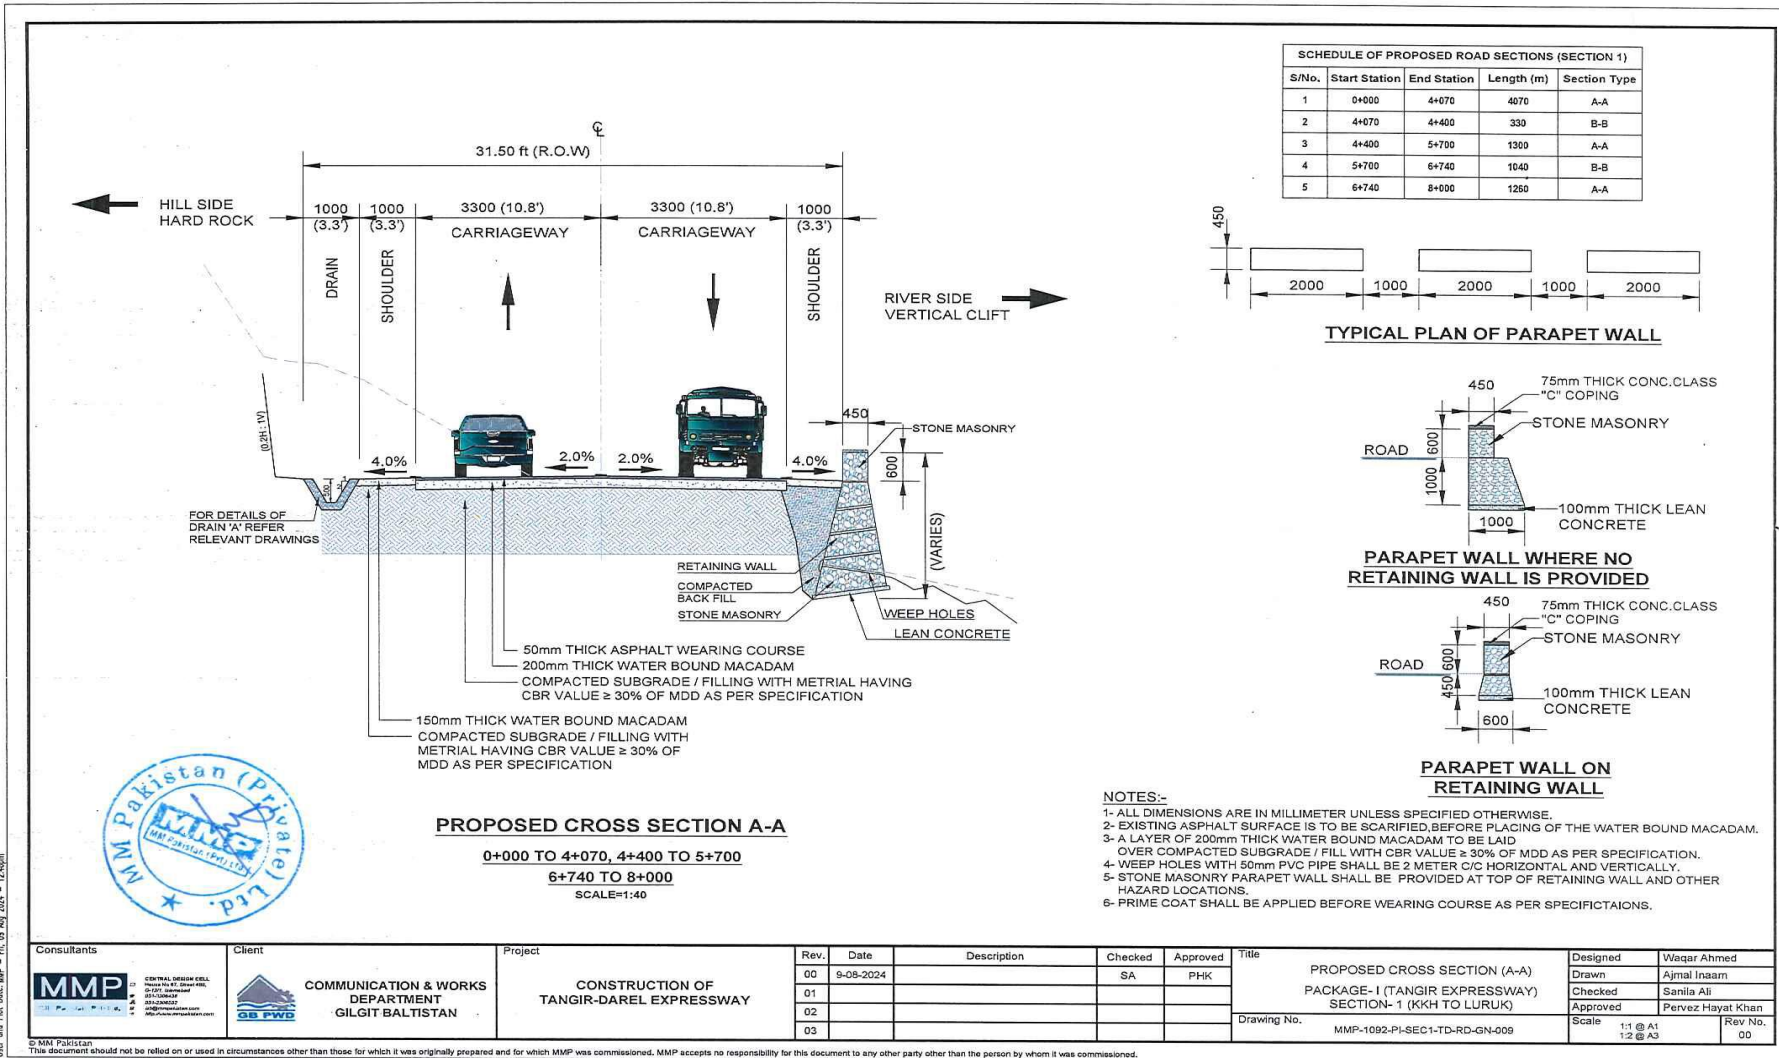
Typical Cross-section of Tangir Expressway (Package -I Section-1)
